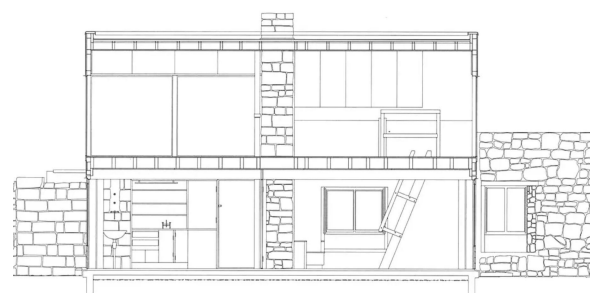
Longitudinal section of the Upper Lawn Pavilion.
